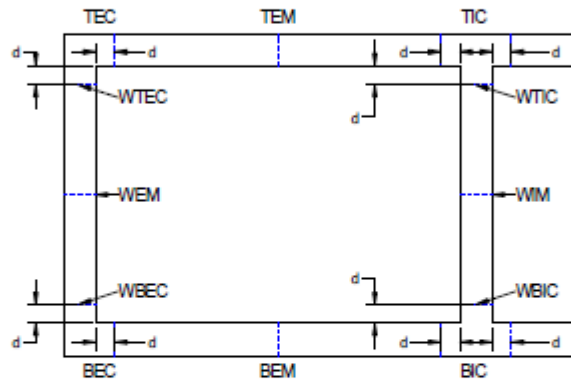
A SHEAR CRITICAL SECTIONS FOR CULVERTS WITHOUT HAUNCHES.
